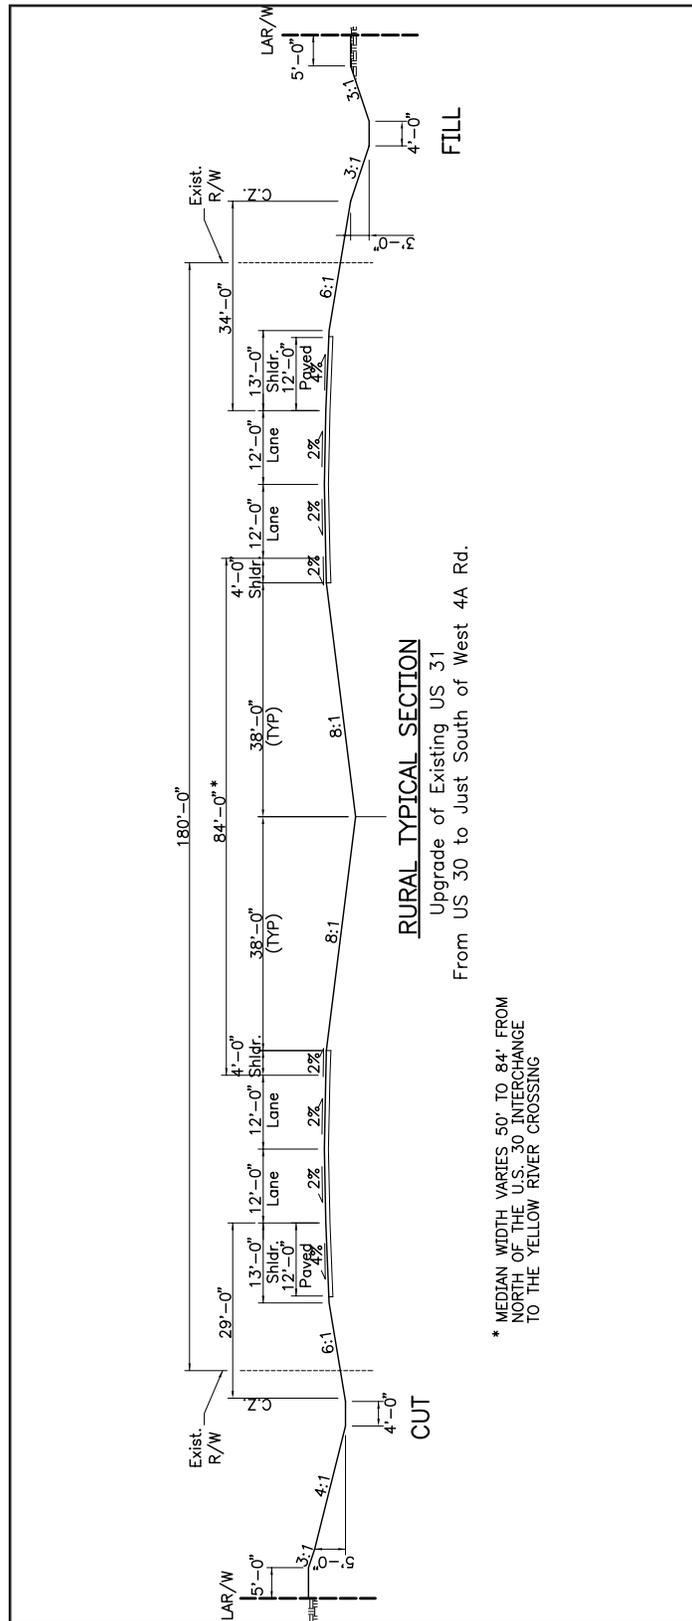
Rural Typical Section (From US 30 to Just South of West 4A Road)
